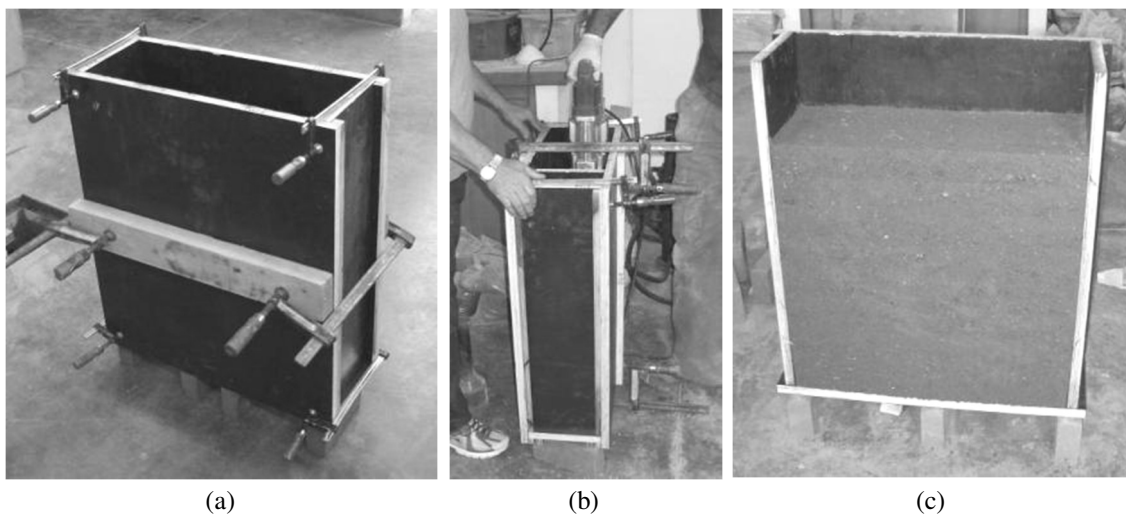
Manufacture of the wallet-specimens: (a) plywood formwork; (b) compaction by electric rammer; (c) demoulding.
